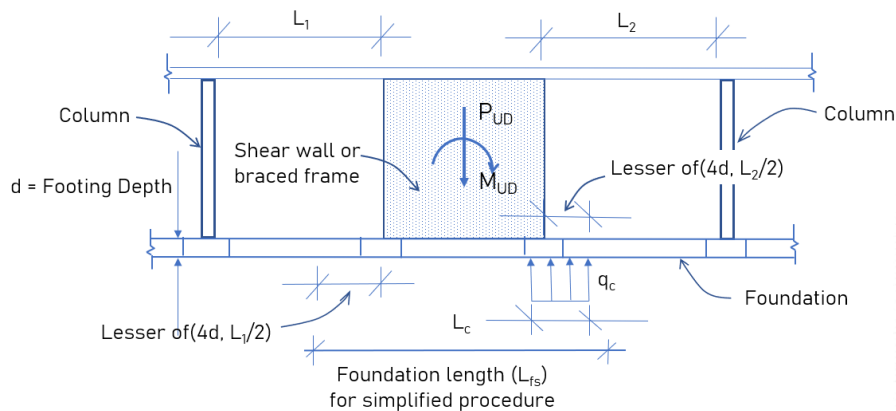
Proposed foundation evaluation procedures for buildings on shallow foundations.
